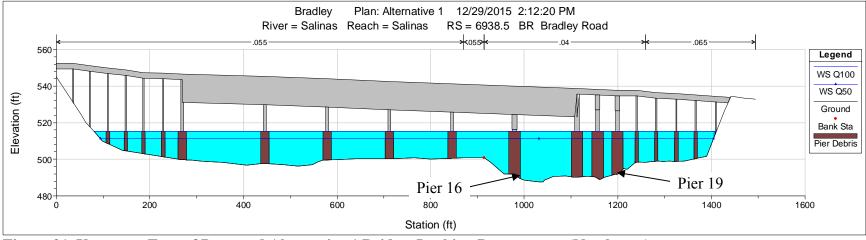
Upstream Face of Proposed Alternative 1 Bridge, Looking Downstream (Northwest)
